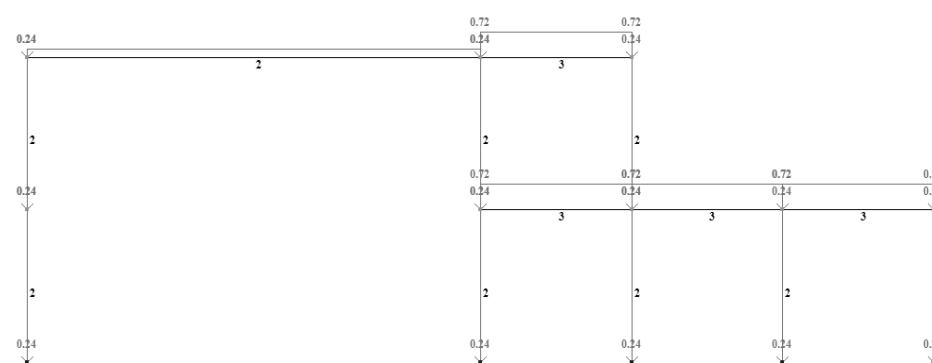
The loading scheme of frame by a dead load of elements.
